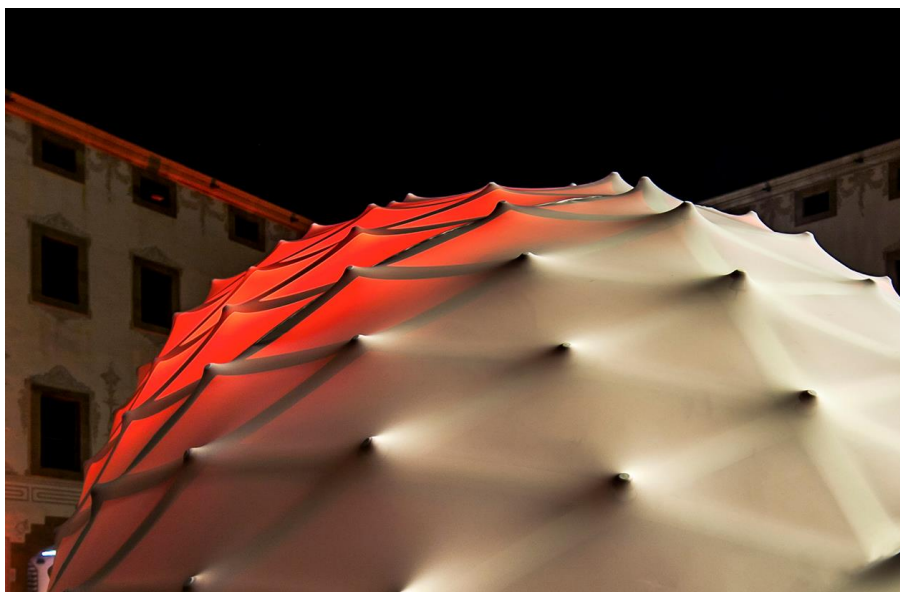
Unpatterned membrane stretched over a gridshell made from GFRP Planks.
